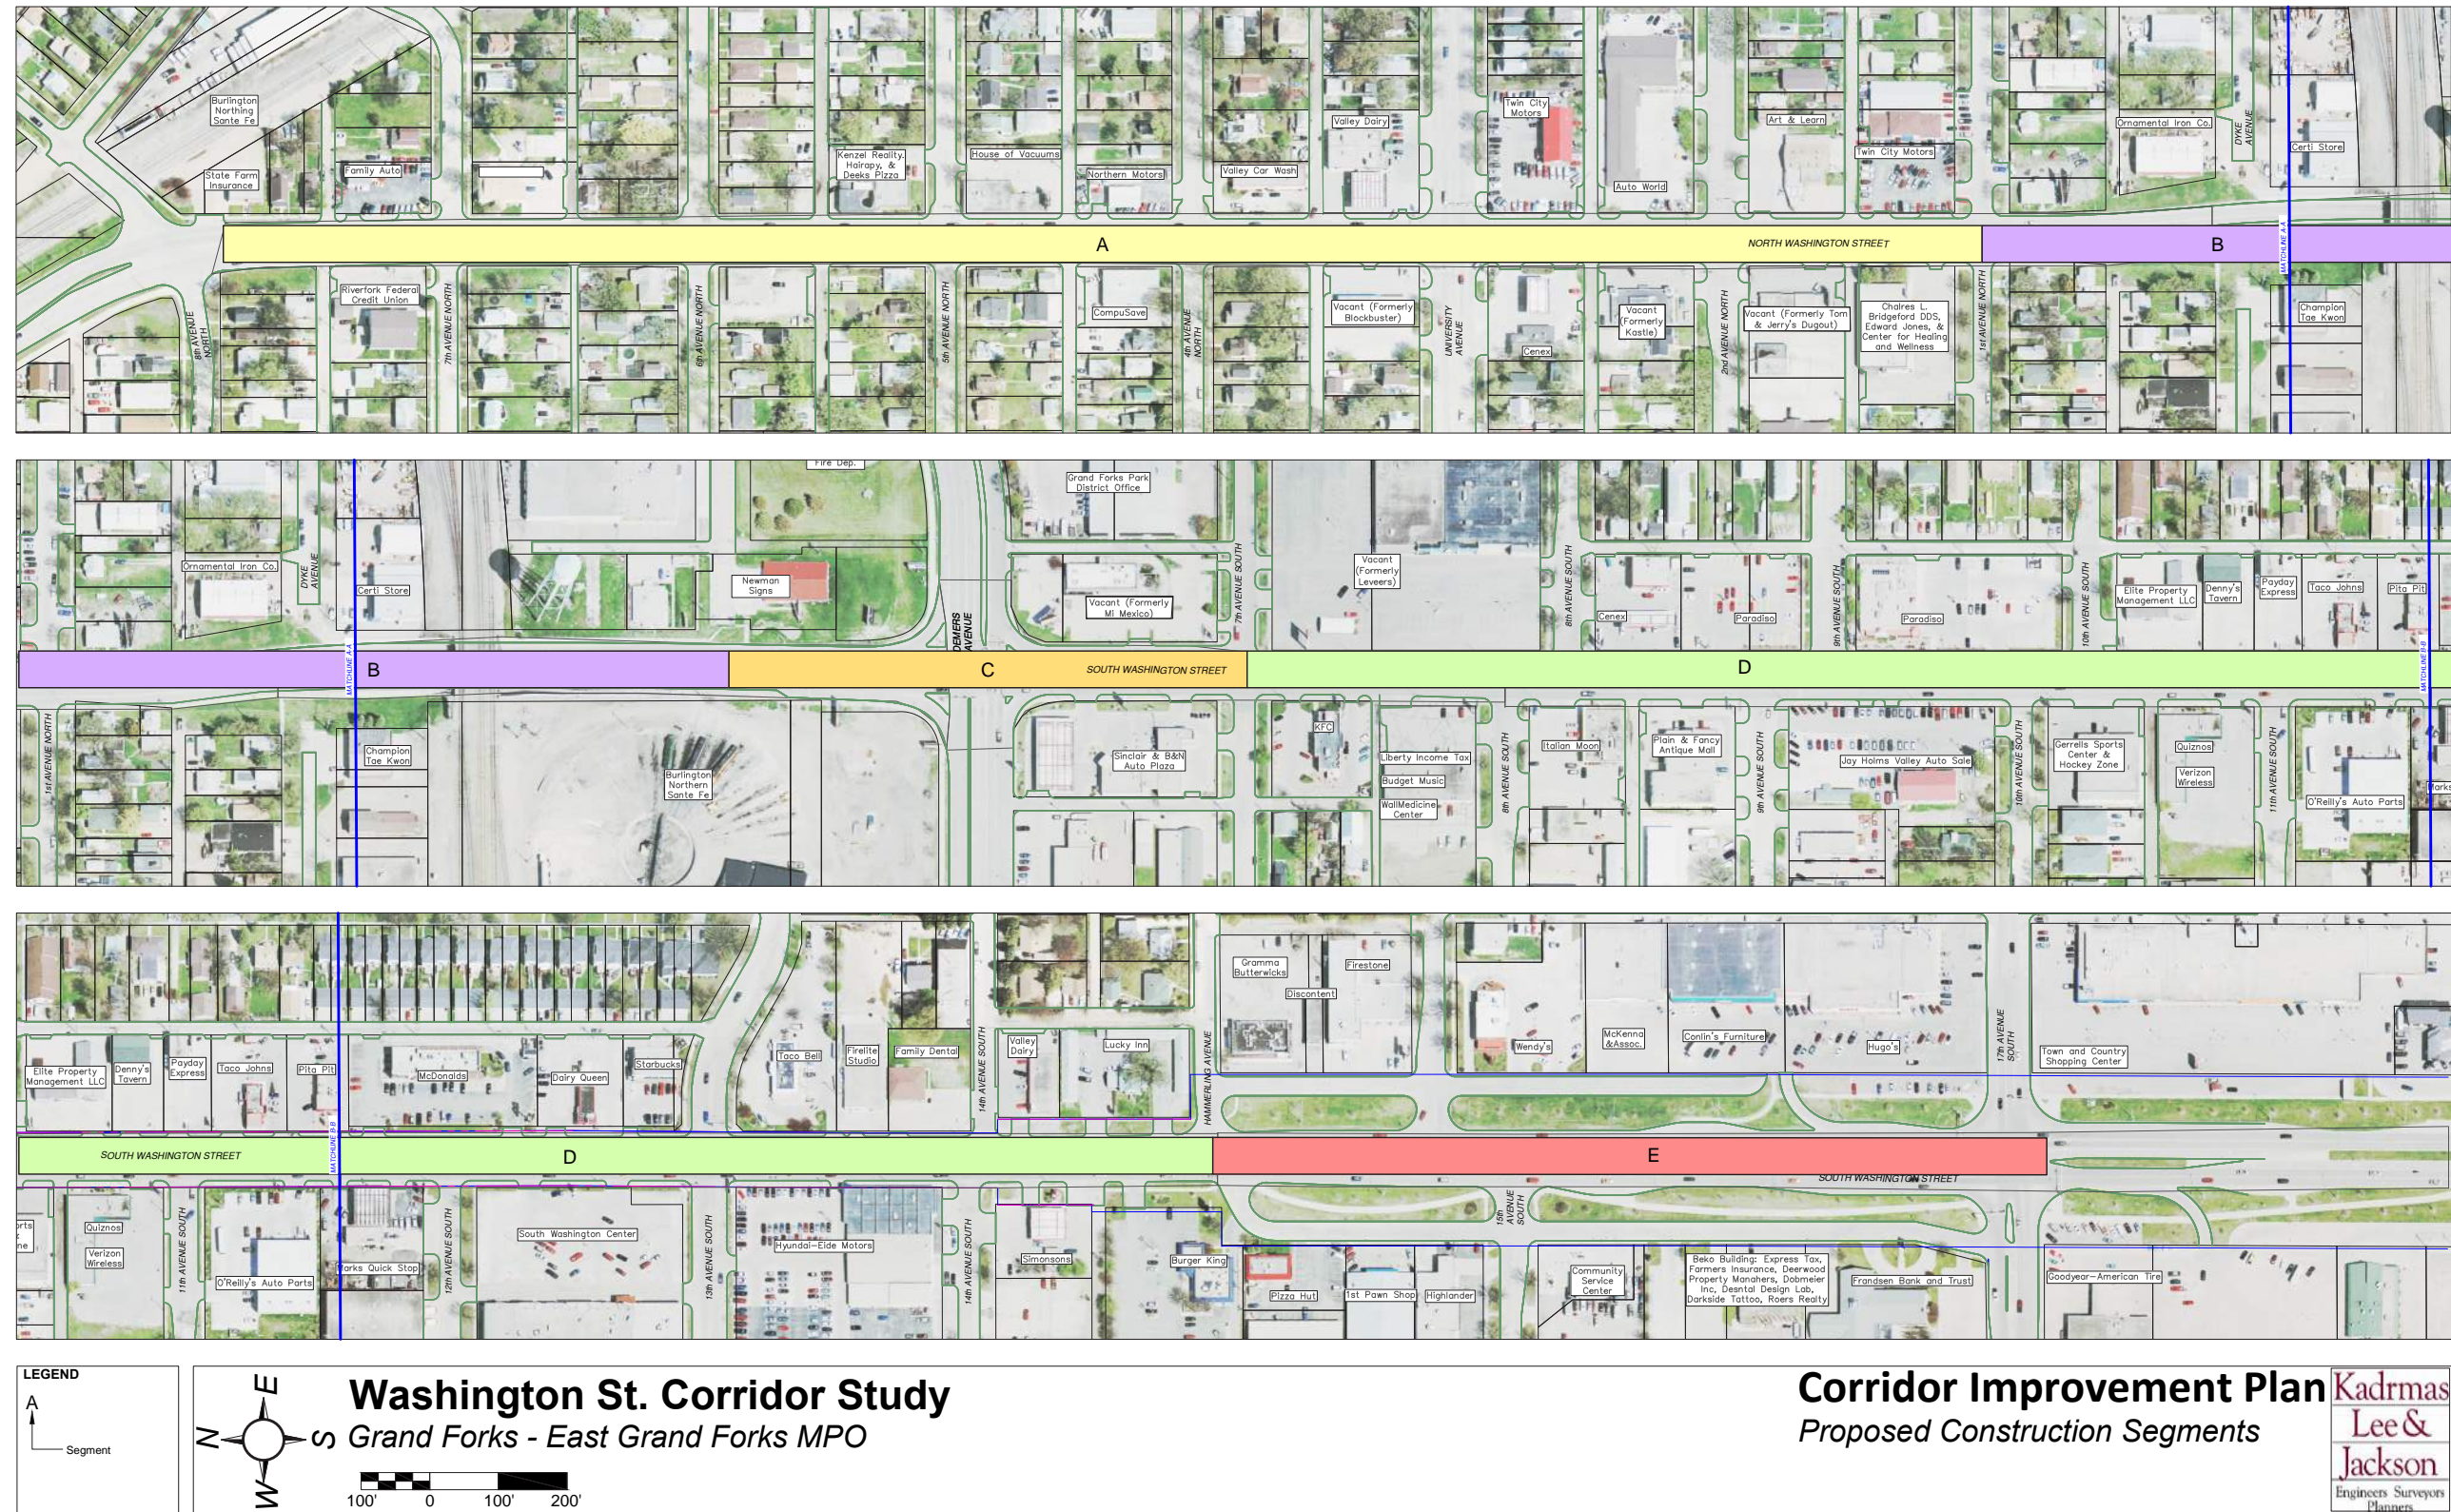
Corridor Improvement Plan Proposed Construction Segments
